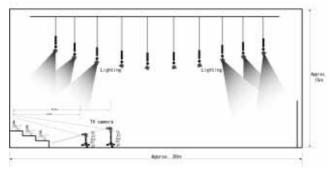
600m² [C-600-1] Studio Layout
